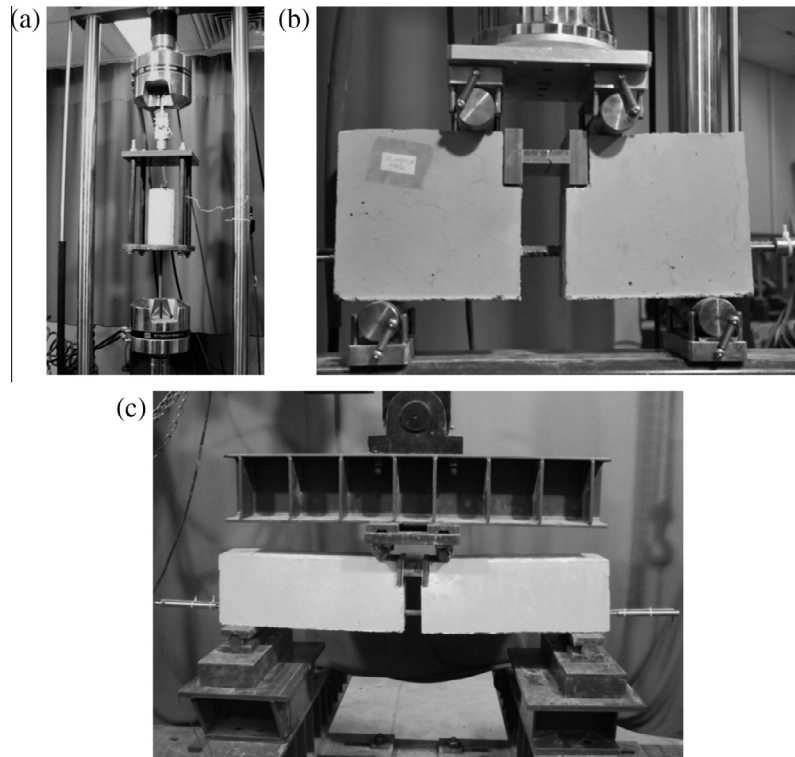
Test set-ups: (a) for direct pull-out; (b) for beam tests (all beam specimens except X_16_10); and (c) for beam tests (for X_16_10 beam specimens).
